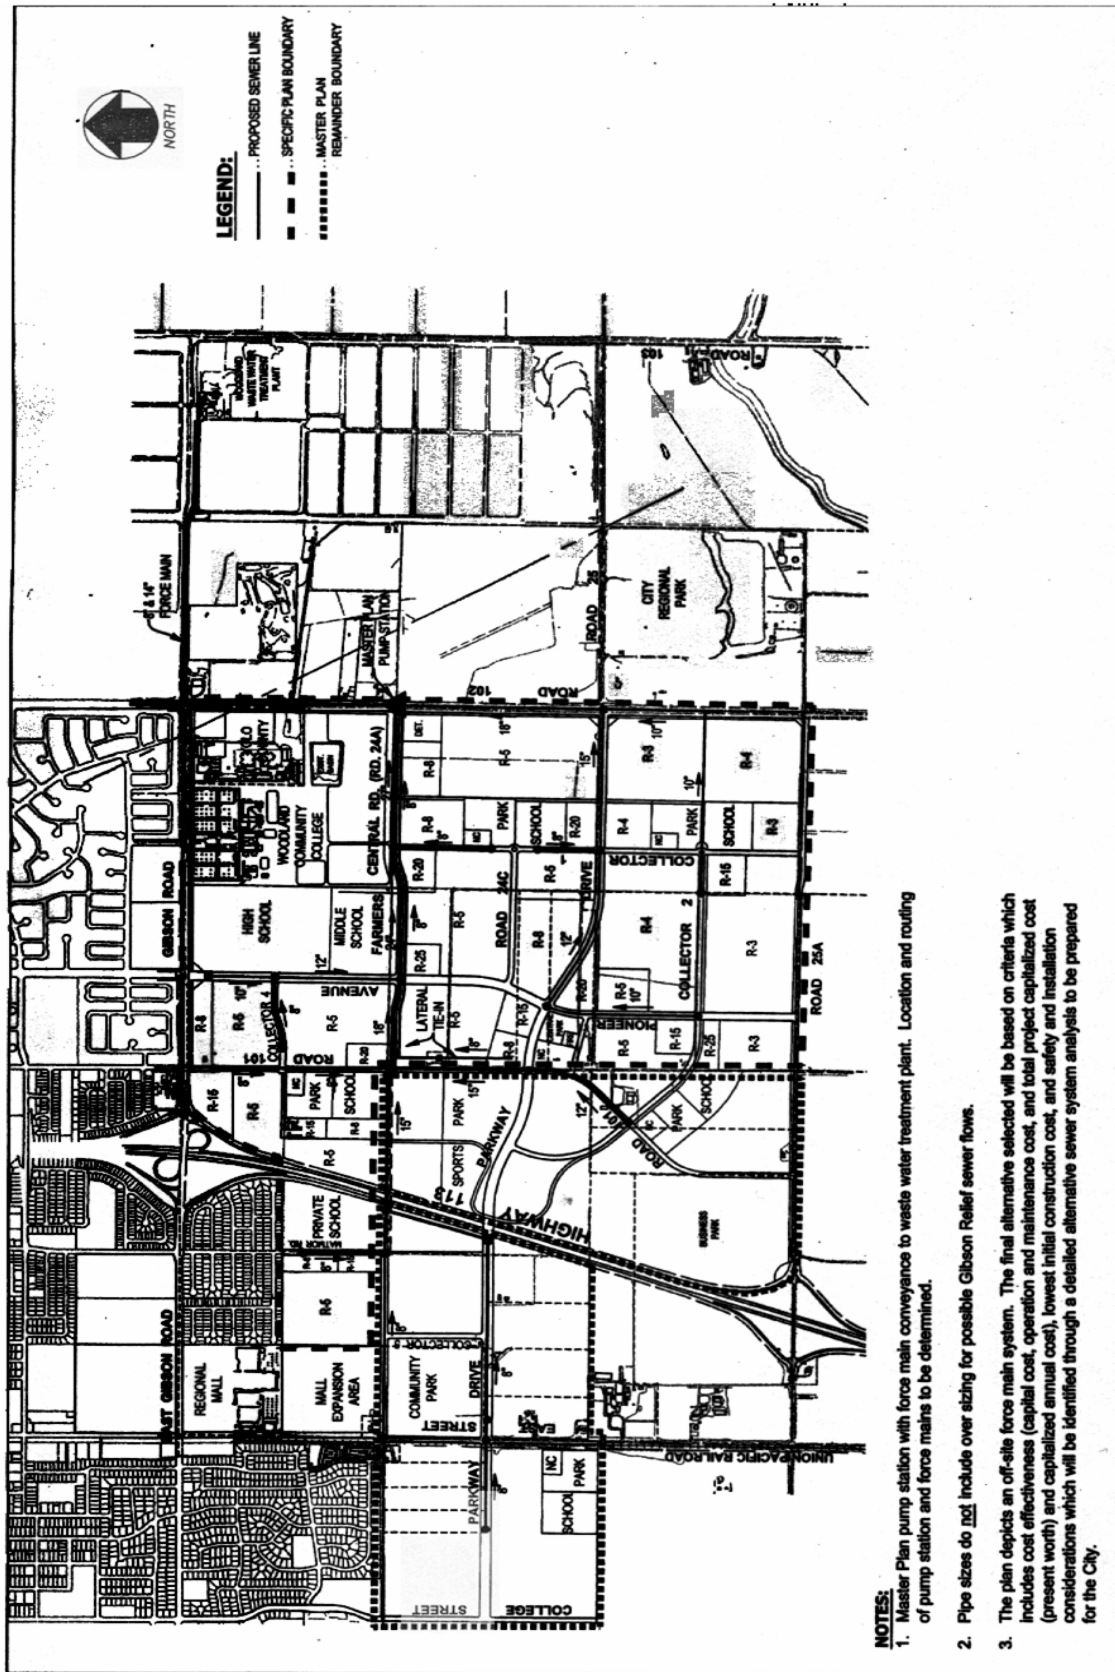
Preliminary Sewer Infrastructure Plan
